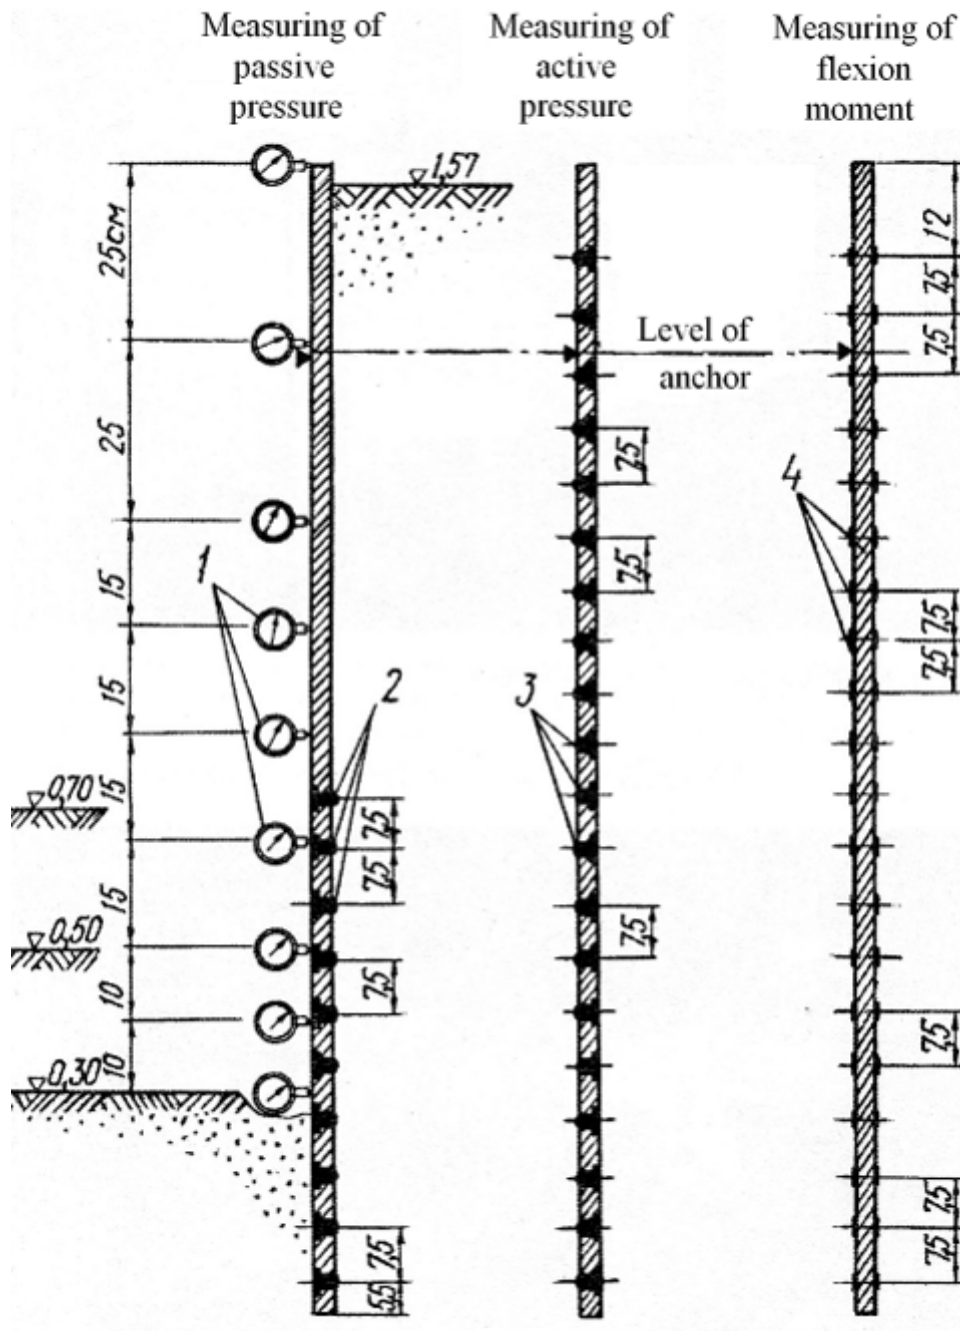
Schematic longitudinal sections of sheet piles models with sensing devices
